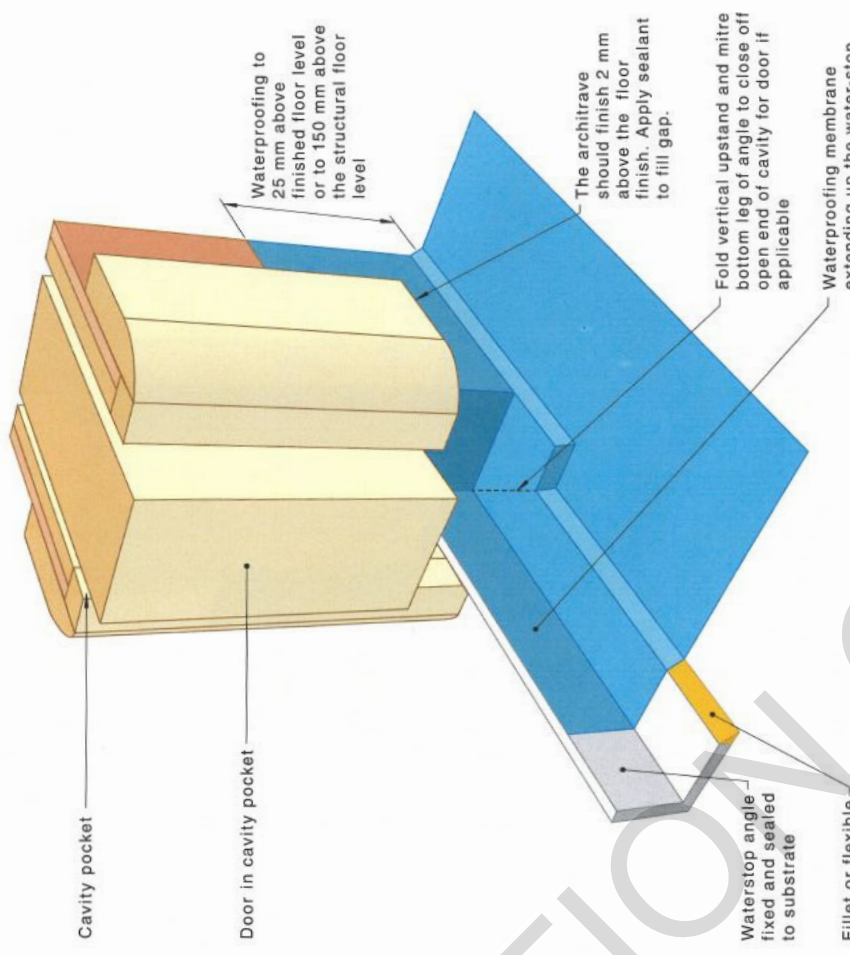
(B) — Waterproofing at door opening cavity slider
